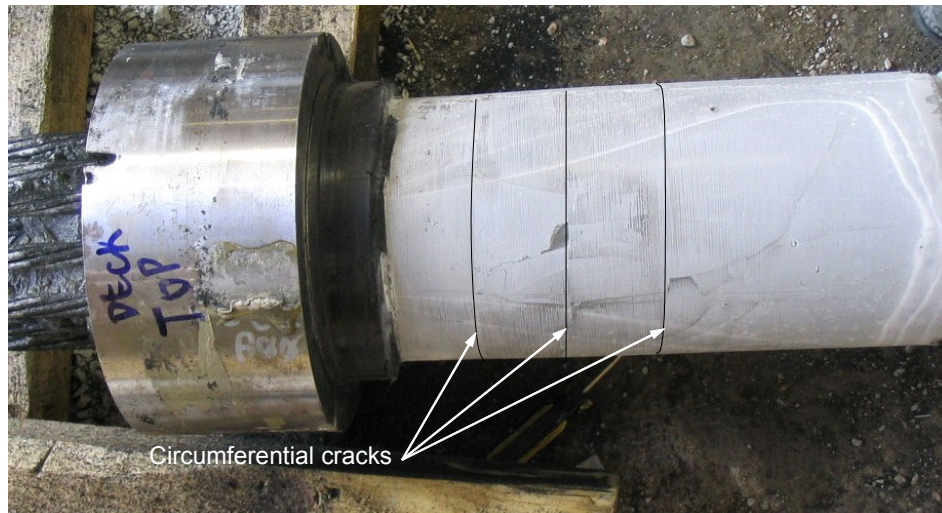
Grout condition at deck anchor head immediately after removing polyethylene pipe - Specimen 7
